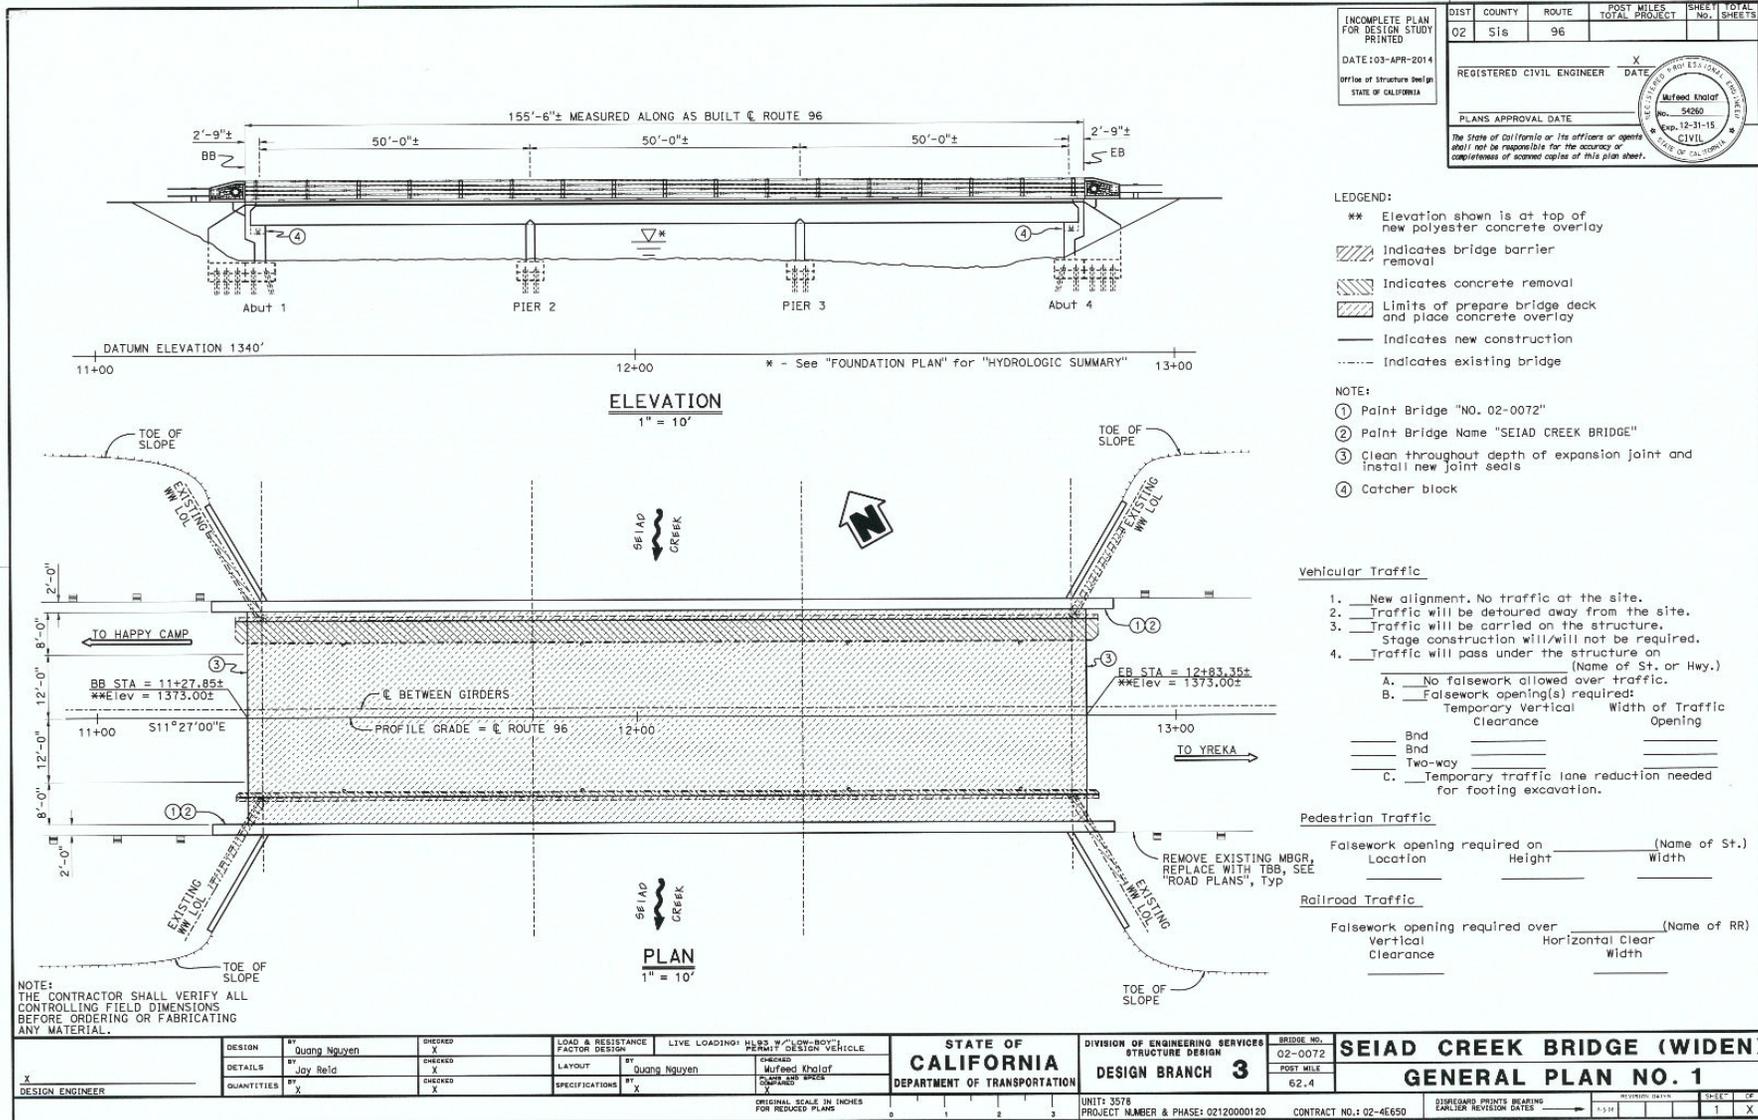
Bridge General Plan. Seiad Creek. Page 1 of 2.
